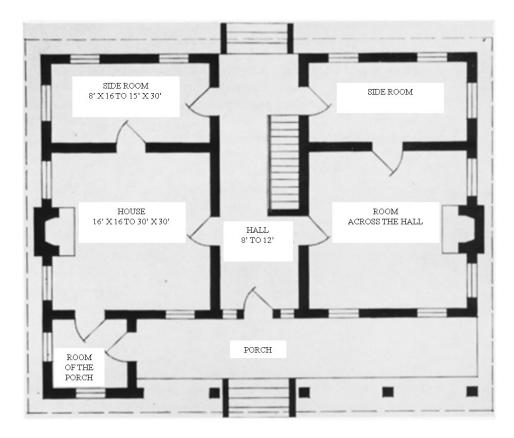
Typical floor plan showing room arrangement and proportions of an East Texas house. Source: Evans, 1952.
